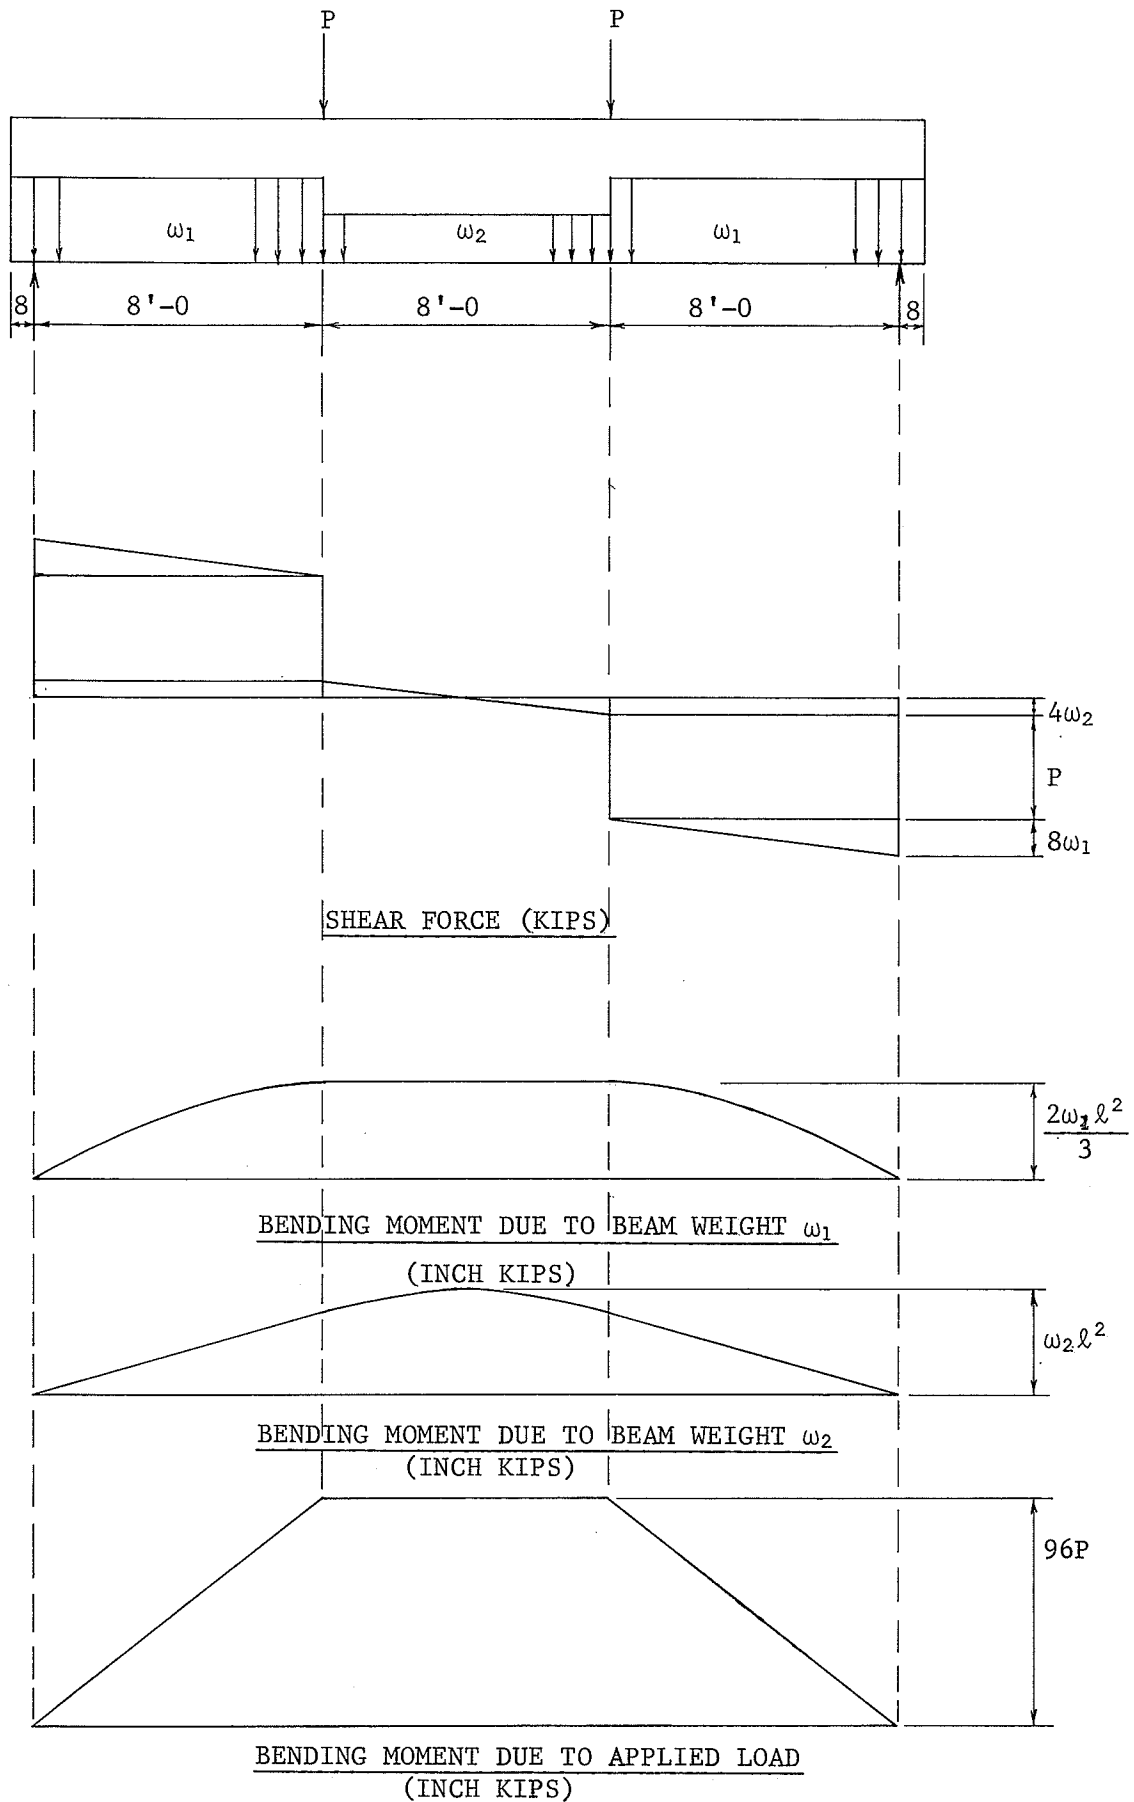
LOADING DIAGRAM FOR END-FILLED BEAMS
